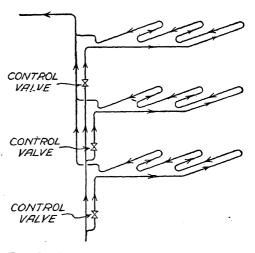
A typical arrangement of pipe circuit for embedded panel warming
